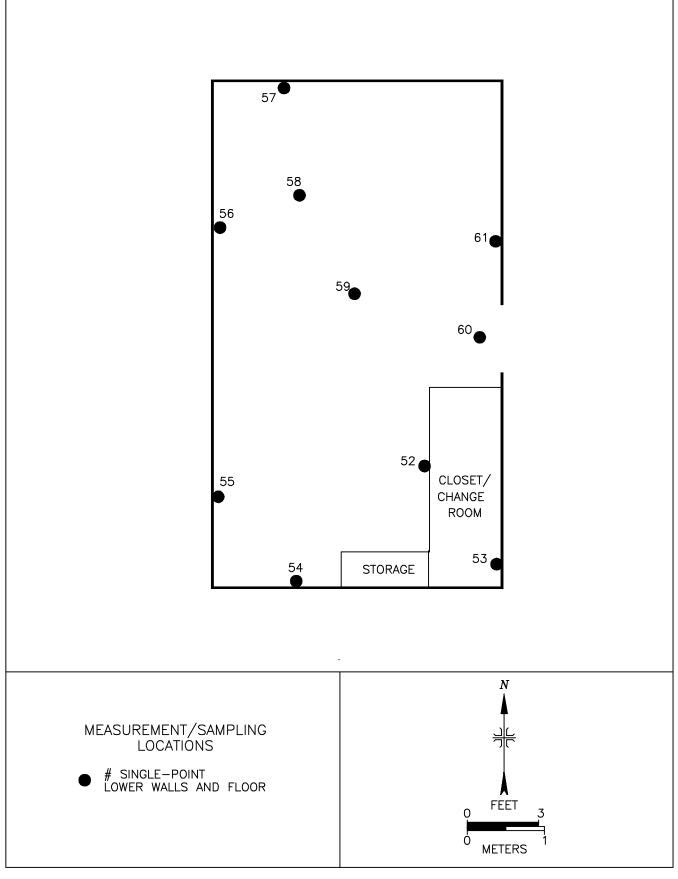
Building 14, Whole Body Count Room -Measurement and Sampling Locations
